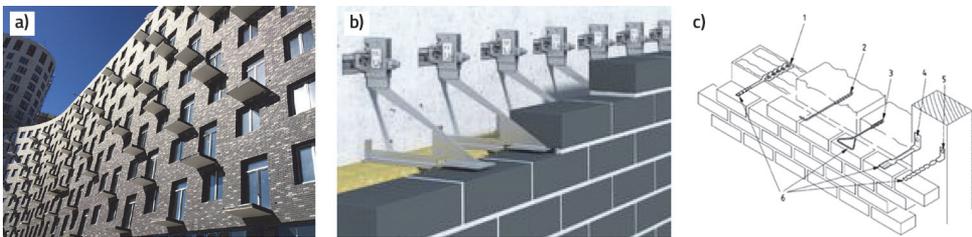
a) Brickwork façade; b) Brickwork support brackets; c) Various wall ties [3]
